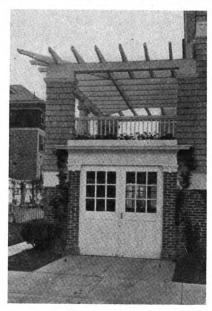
A pleasant pergola is built over the roof of this garage, forming a porch and making the addition do double duty. The pergola costs but little extra, and is a decided asset to the looks of the house.
